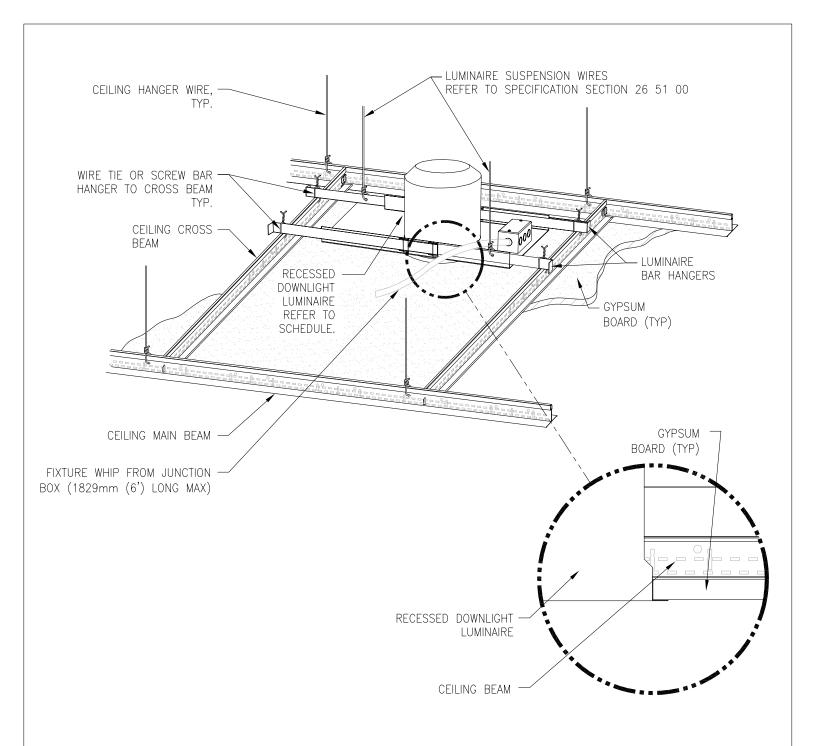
DETAIL TITLE / LUMINAIRE MOUNTING - LAY-IN CEILING
